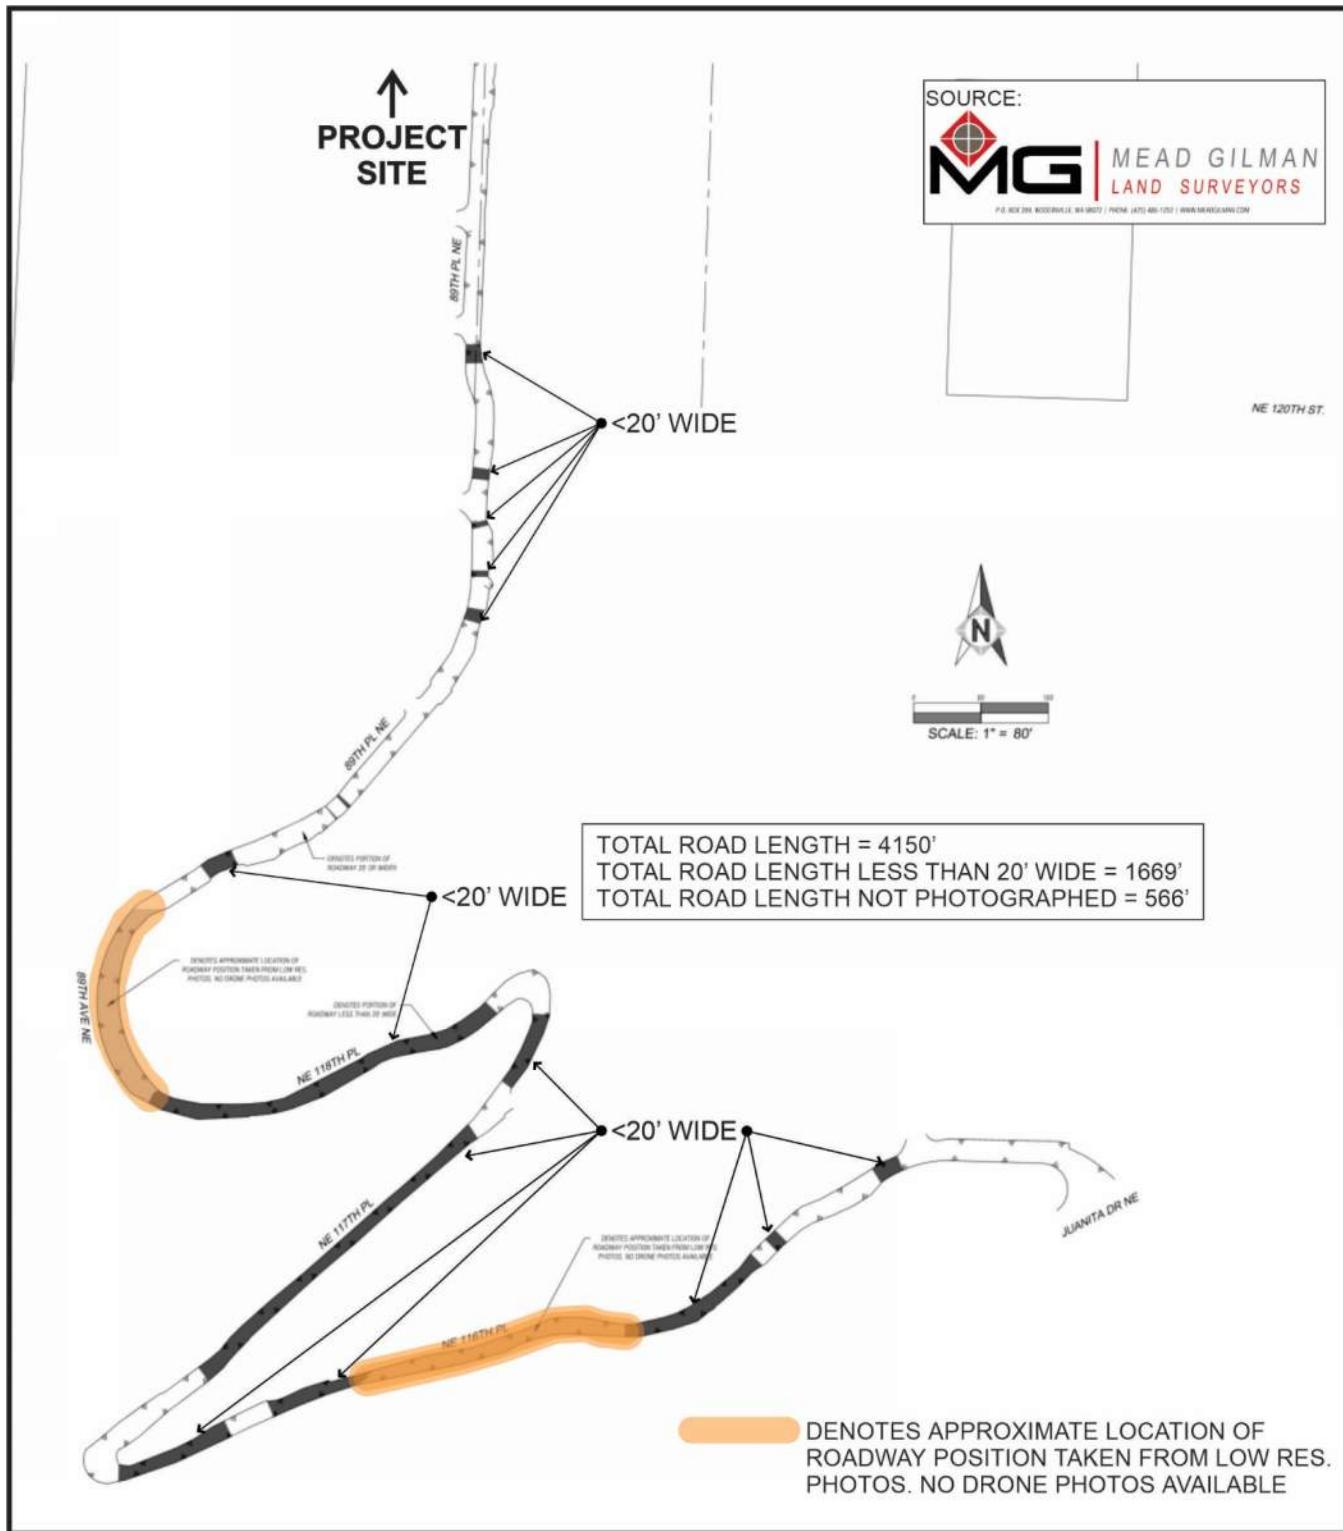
City of Kirkland Goat Hill Pavement Width Exhibit
